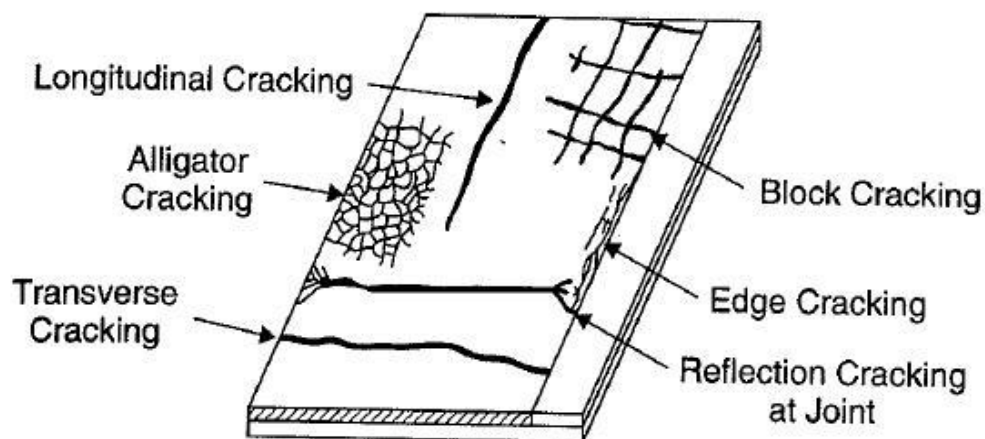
Type of cracks occurring on a road surface (Papagiannakis & Masad 2007)
